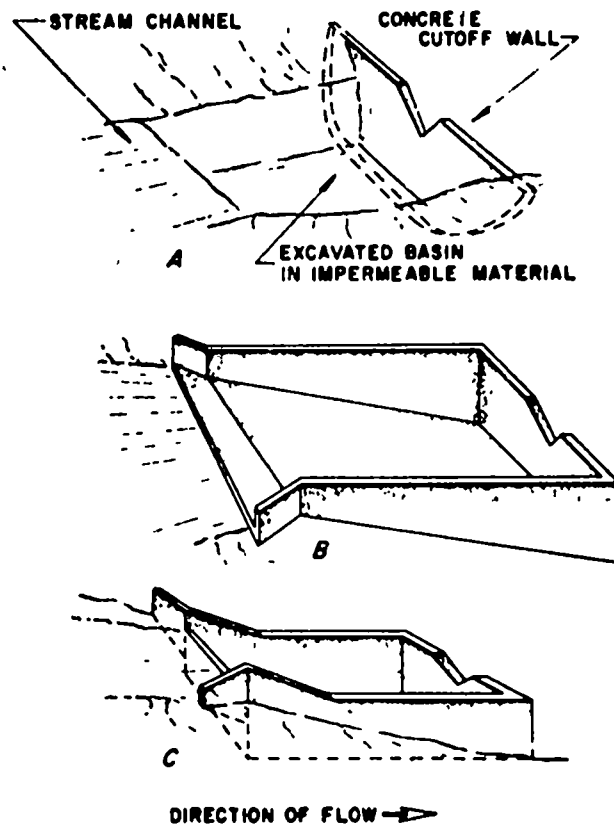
Plans for concrete cutoff wall constructed at Fernow Experimental Forest, Parsons, W. Va.
